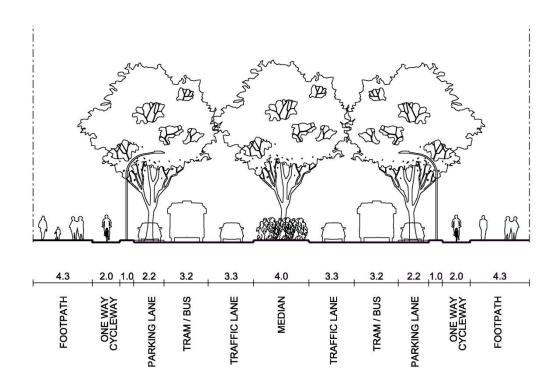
Epsom Park- Zetland Avenue (36m) Section A2
